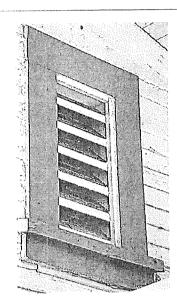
\_2556 View: Louvered Attic vent Photo Date: July, 2020 Camera Facing: West
